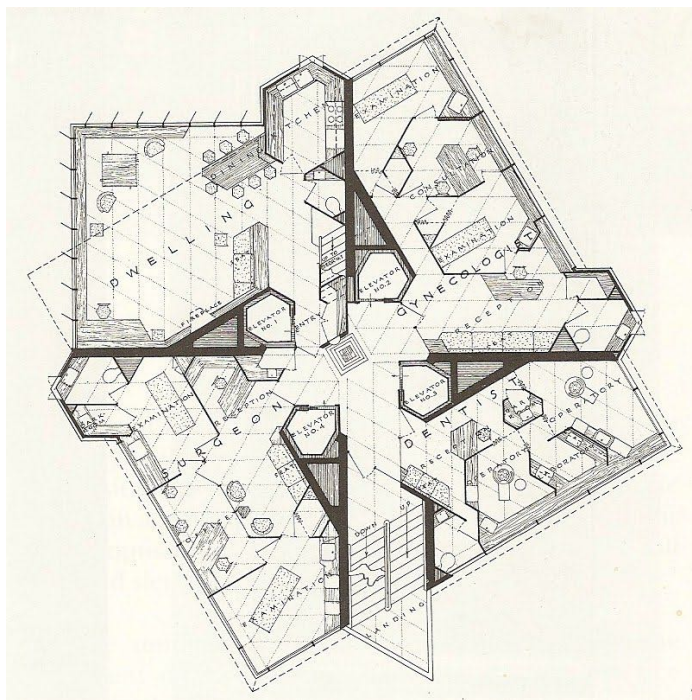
Frank Lloyd Wright, Price Tower floor plan. 1952.
